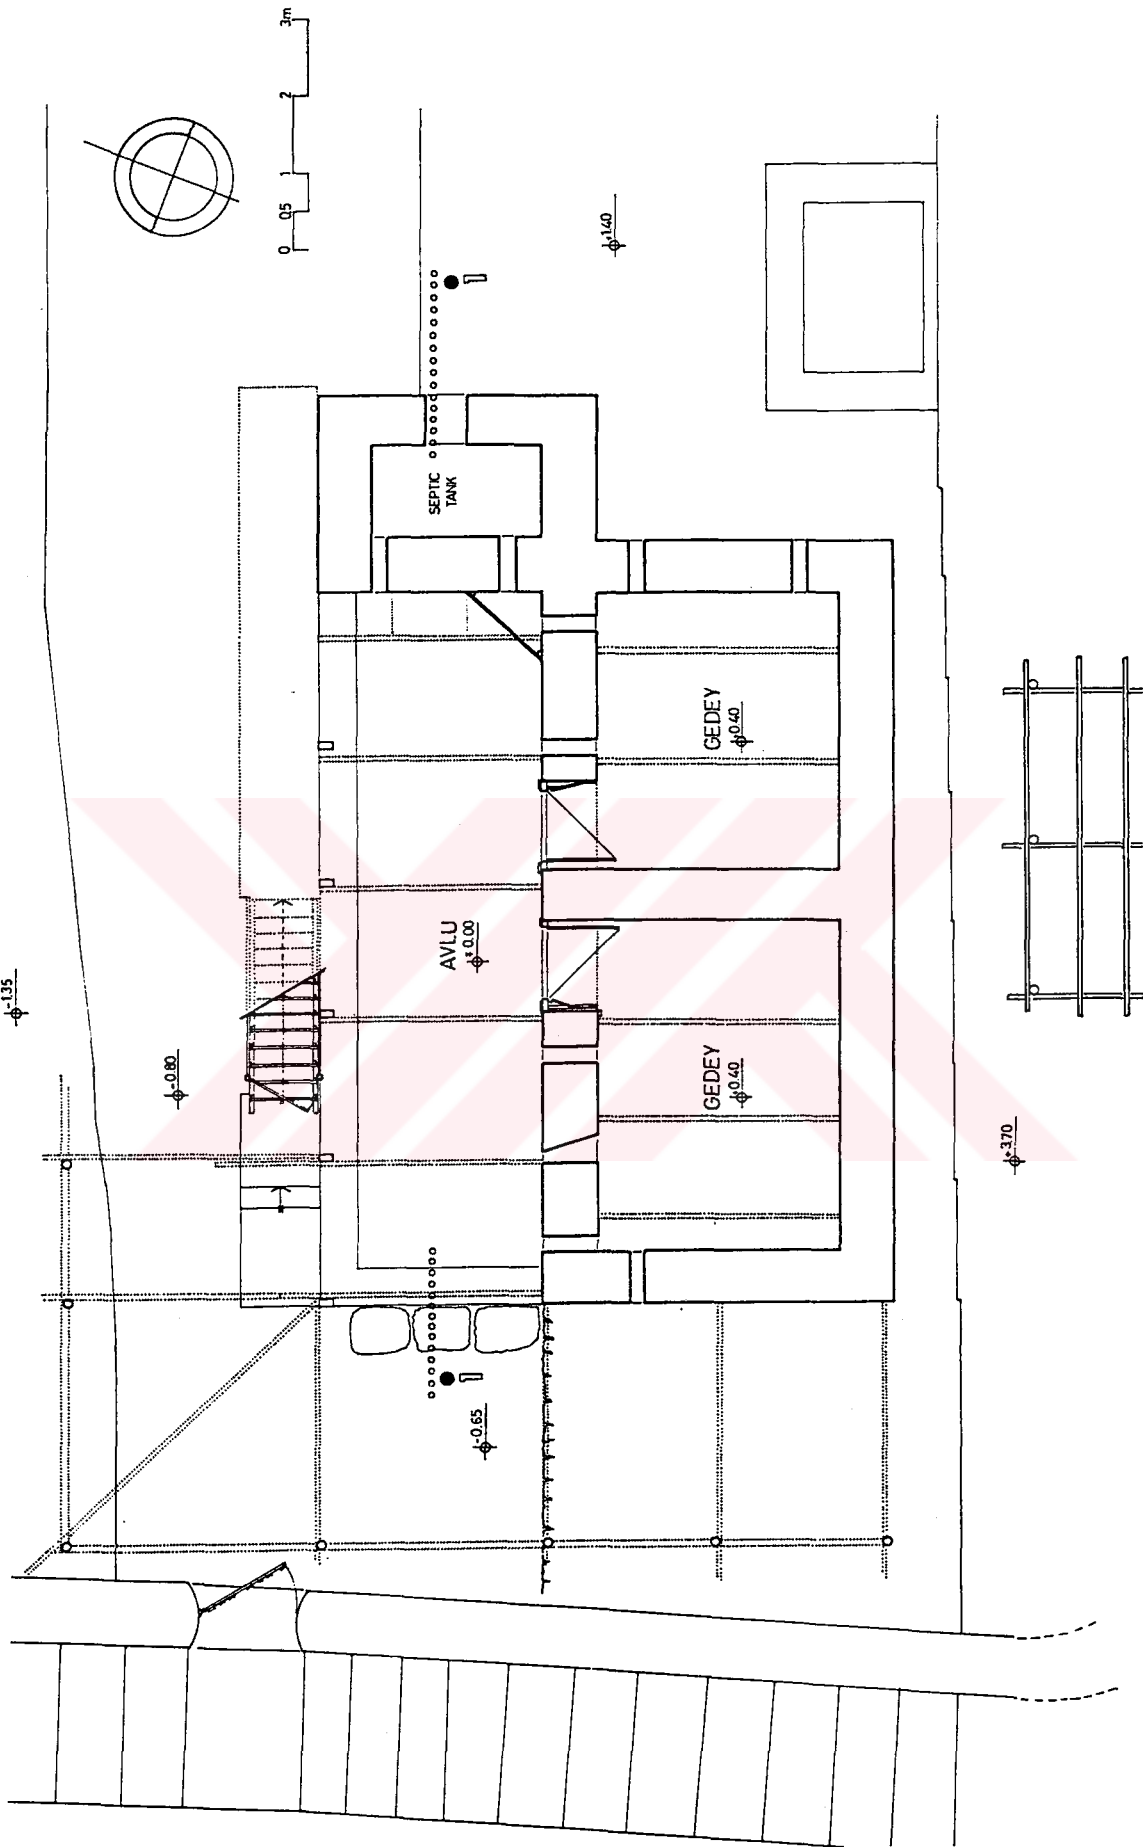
Ground floor plan of Hacı Hüseyinler House
